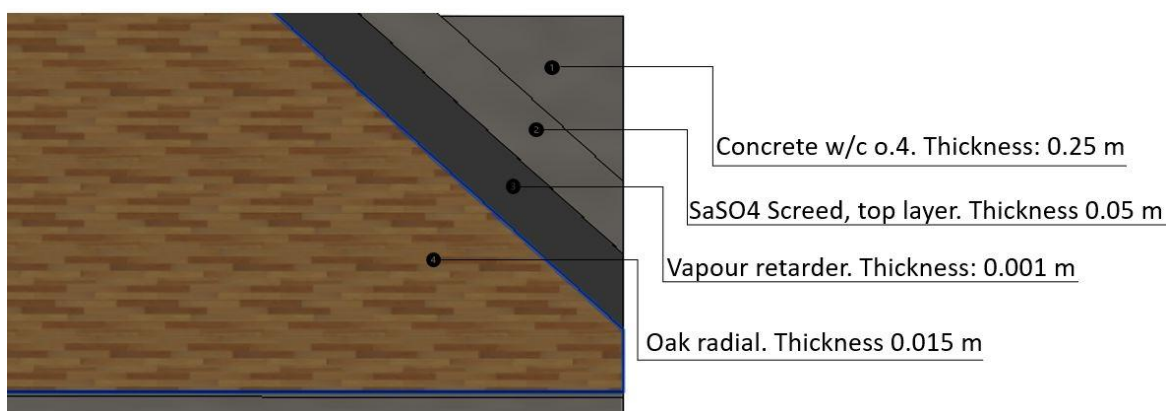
Floor and ceiling of the measured apartment. Byggforsk 541.505 Laying of parquet.
